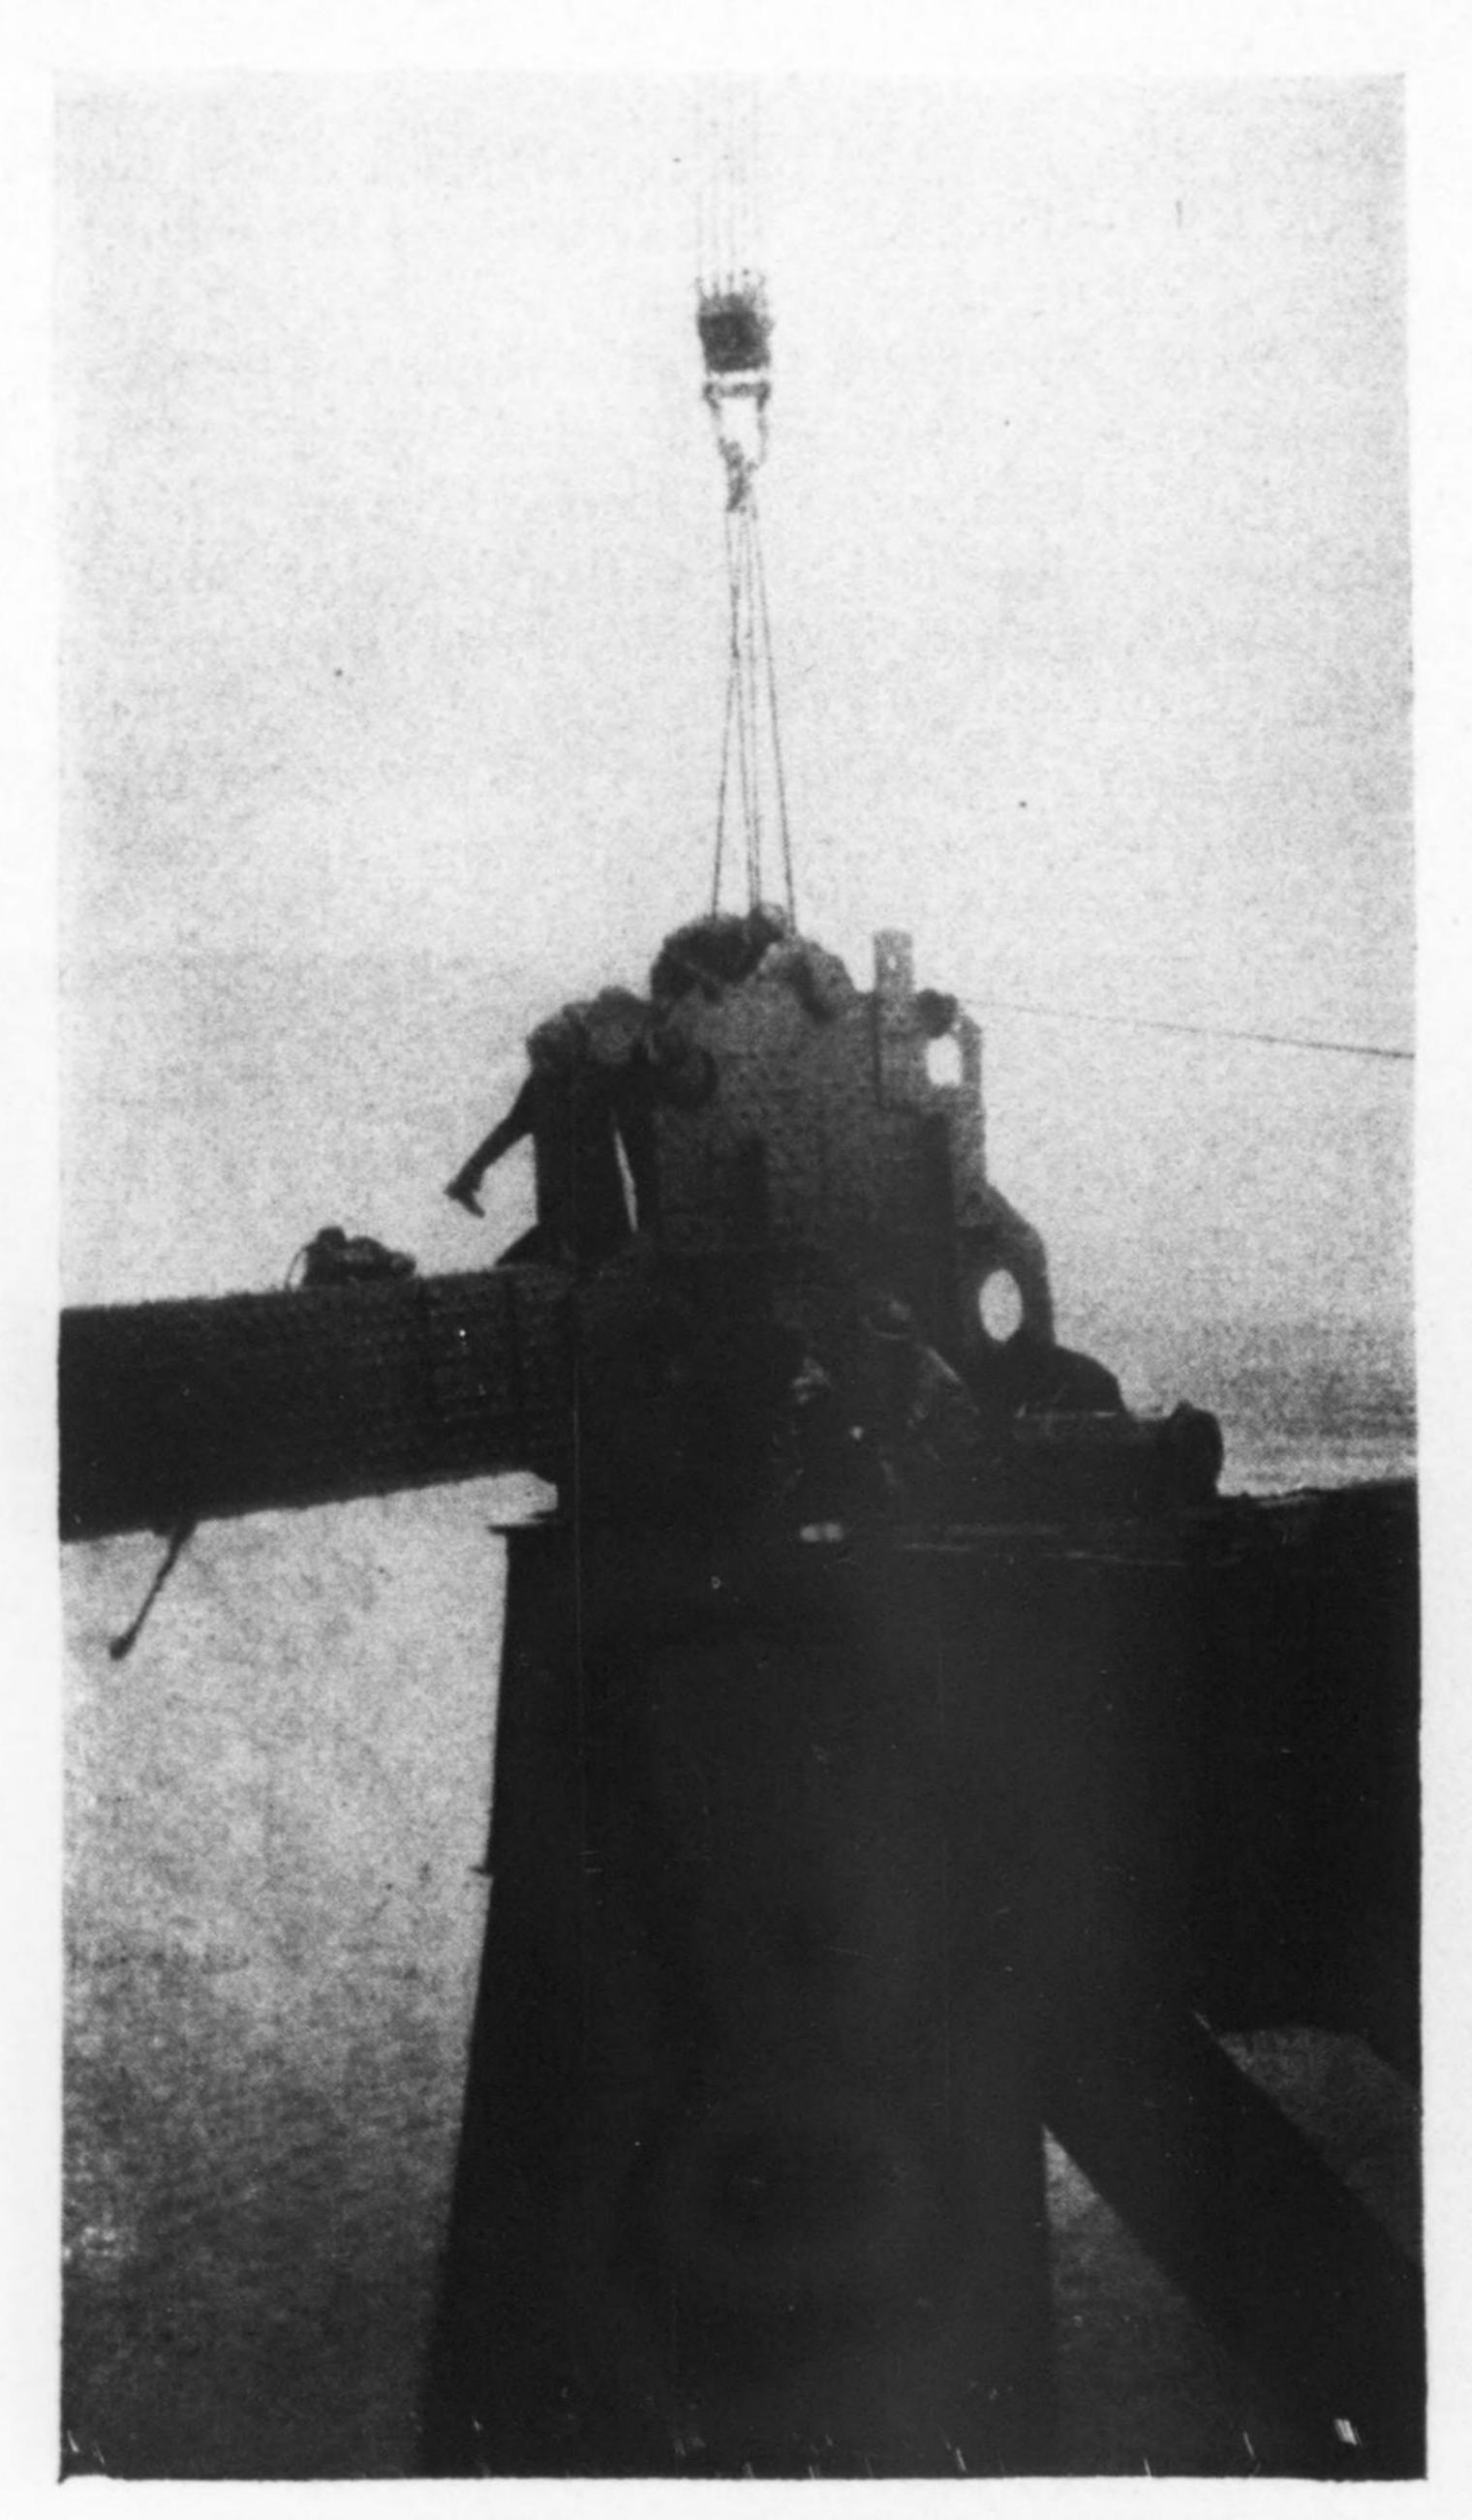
SETTING MAIN SHOE ON TOP OF TOWER AT PIER 2
